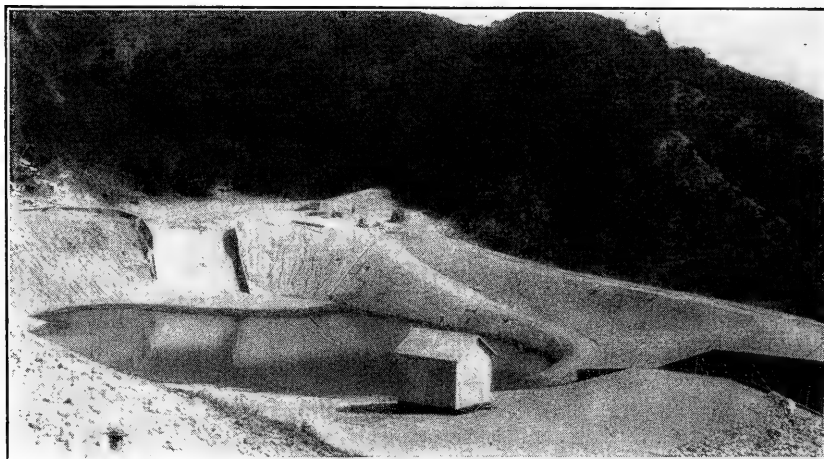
Typical debris basin, La Crescenta area, San Gabriel Mountains. Hay Canyon debris basin, inlet structure in background, outlet structure at right foreground.
